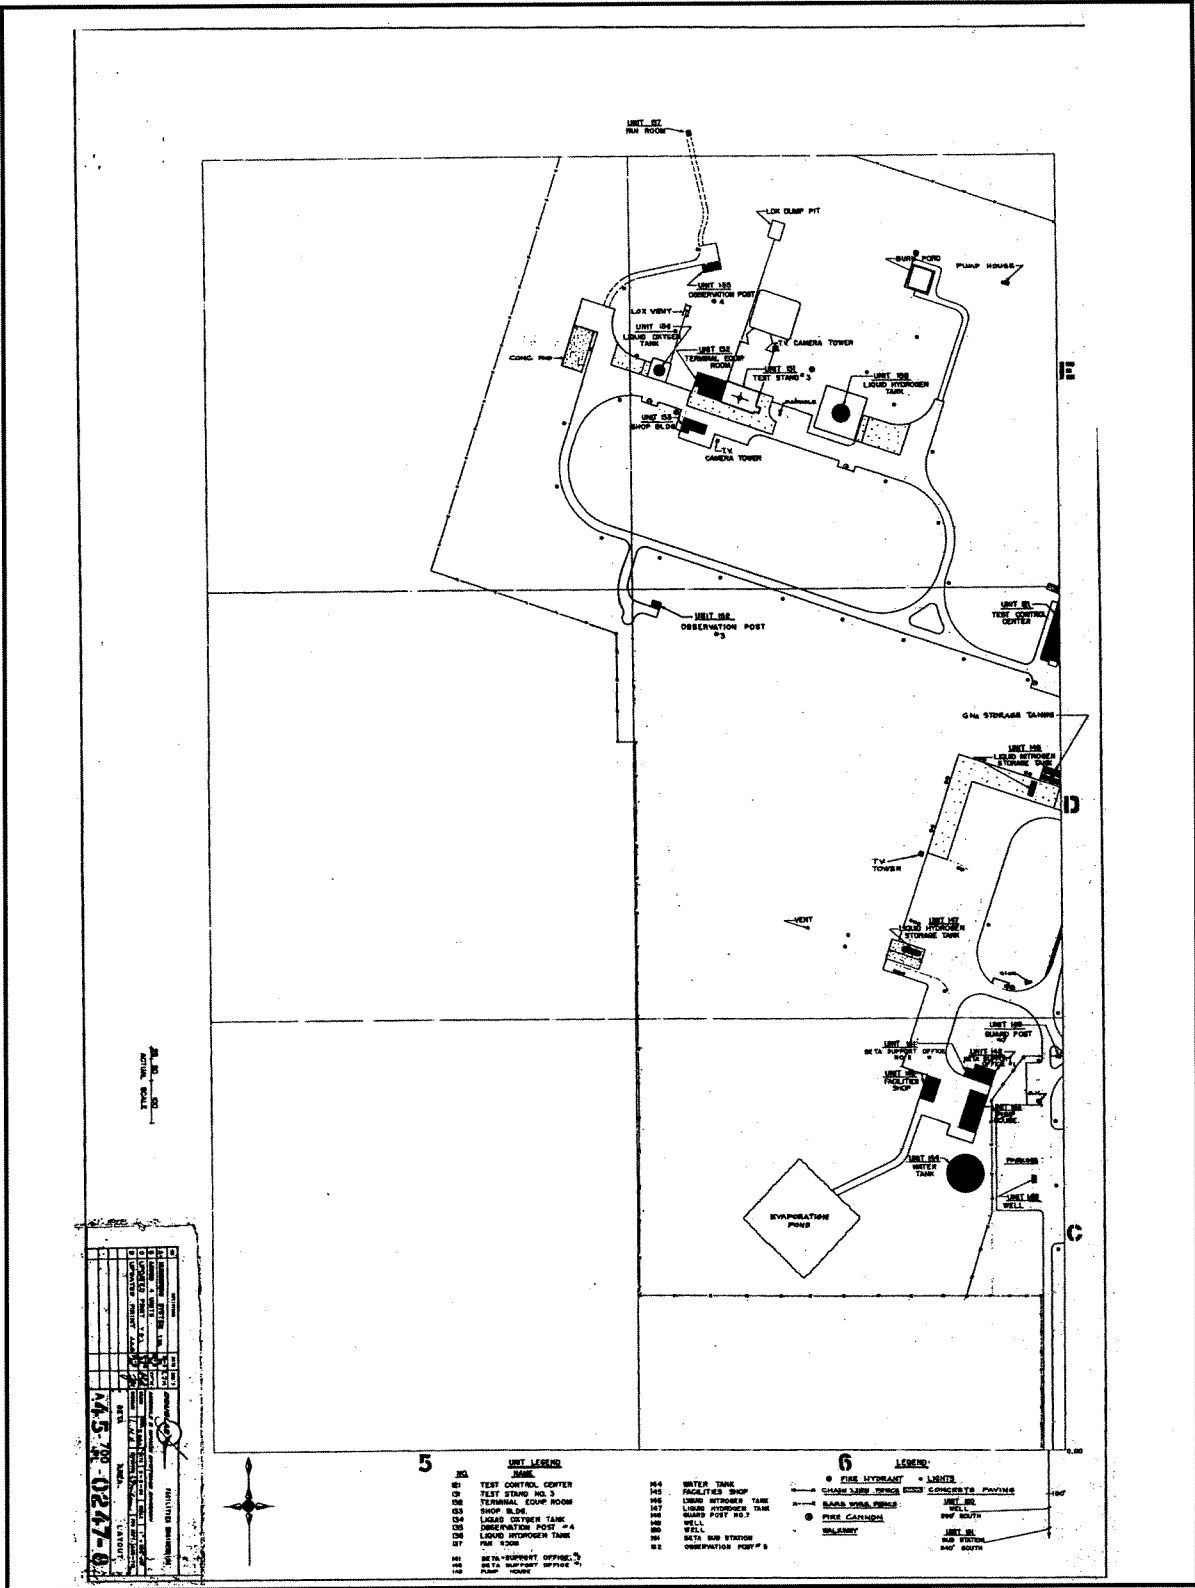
Douglas Facilities Engineering, Beta Test Complex (western half), Douglas Missile Test Facilities, 1964.
